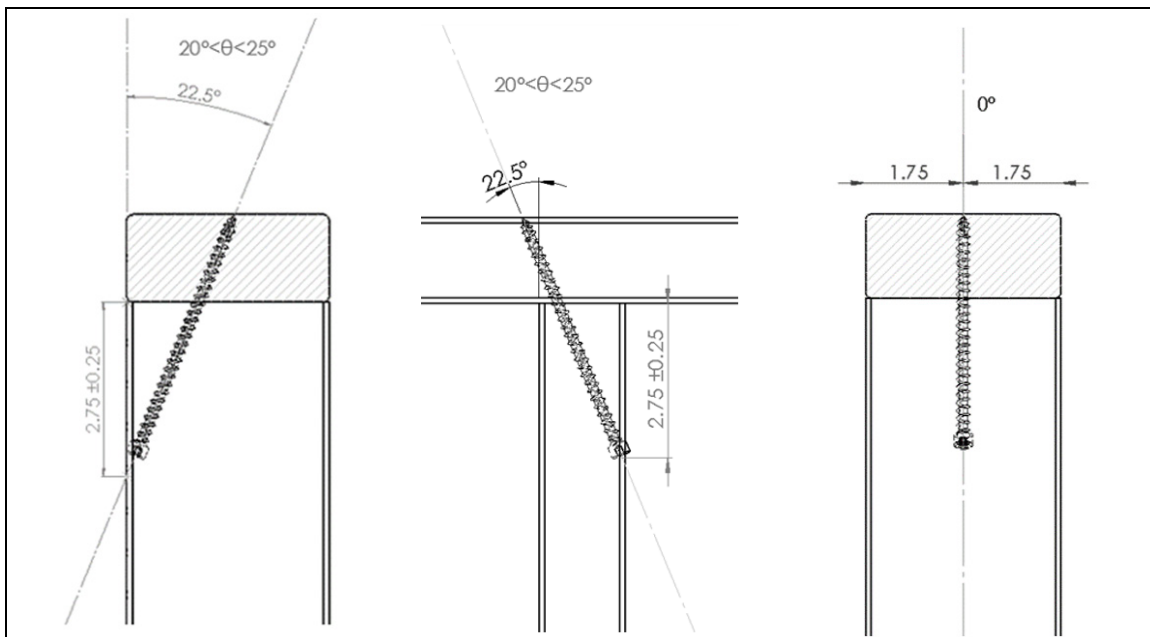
Stud to Top Plate – 22.5° (Angle), Three 6" TRX Truss Screws Install Option
